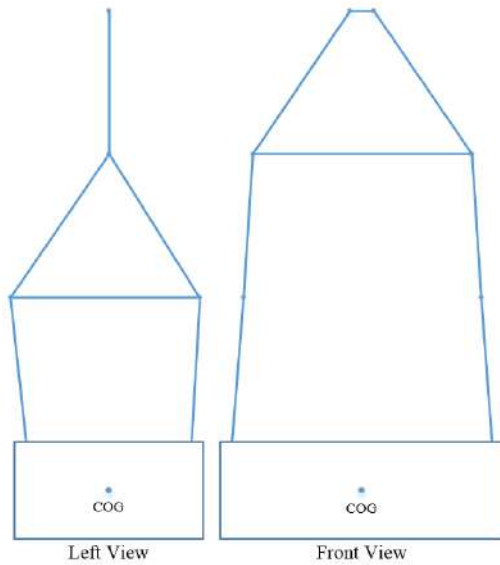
Left and front view of the rigging assembly for a 4-point pick module
